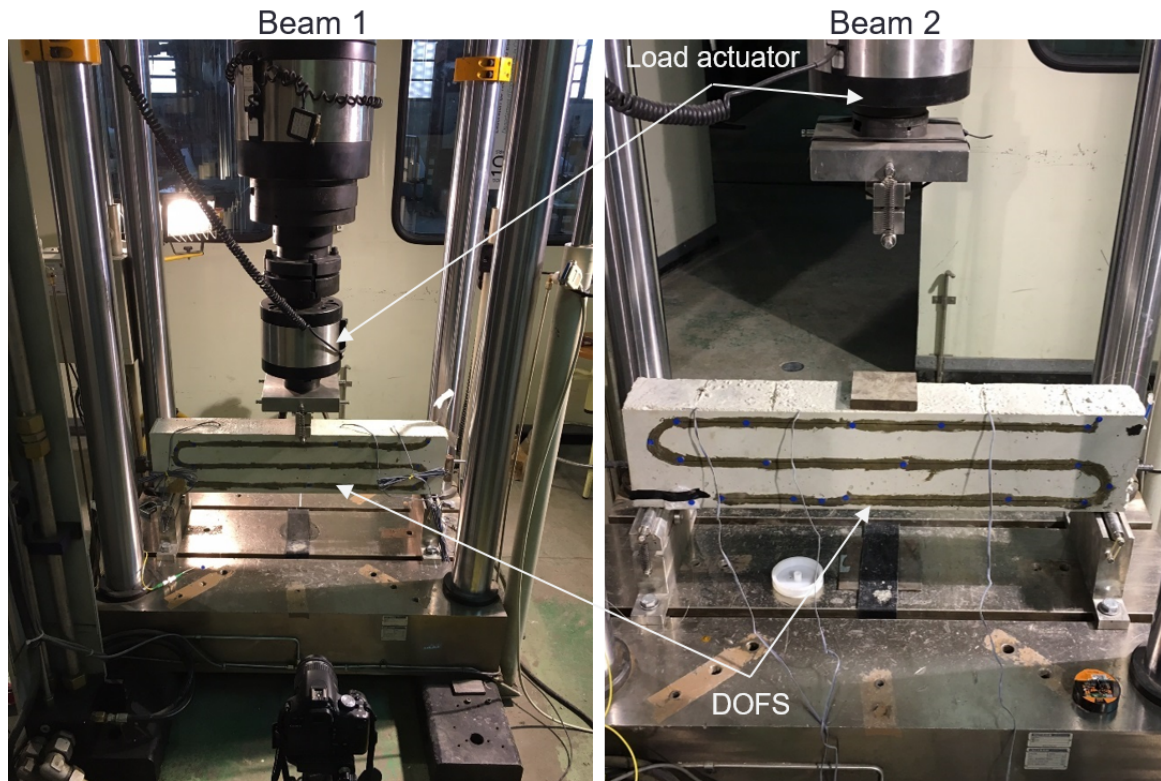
Load test setup for Beam 1 (left) and Beam 2 (right)
